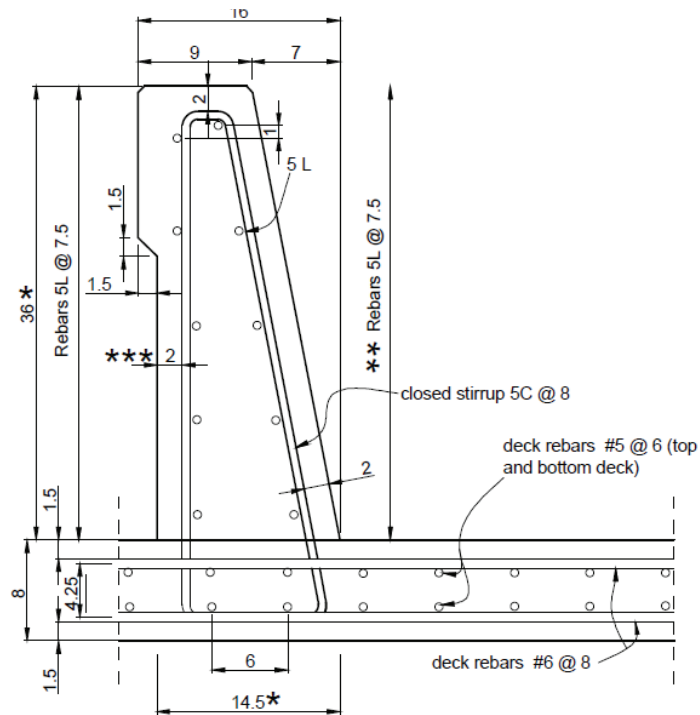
Pendulum specimen single slope 36" section A-A, all measurements in inches
